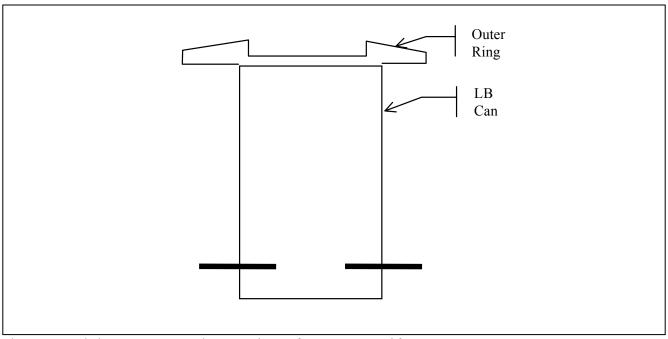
Existing 20 A, 500 W Fixture and Transformer Removed from LB-4 Can
